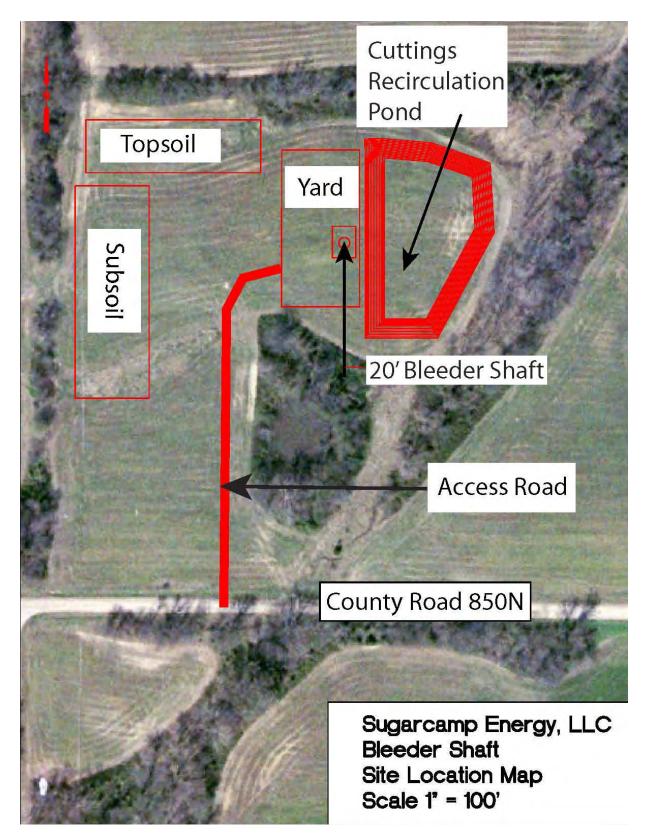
Proposed Plan for Bleeder Ventilation Shaft Installation on Land Overlying TVA-Owned Coal
